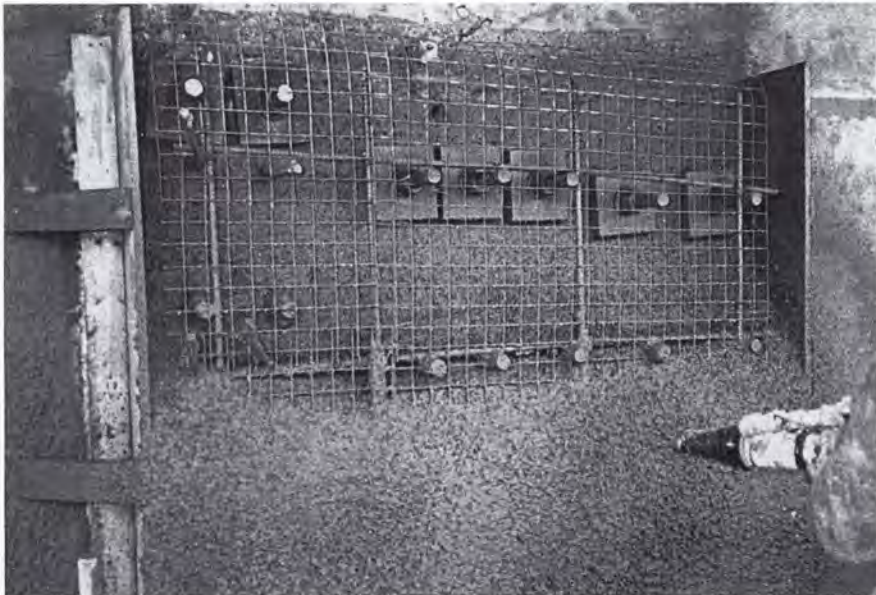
Outside view of transverse Dywidag bars at anchorage block.
